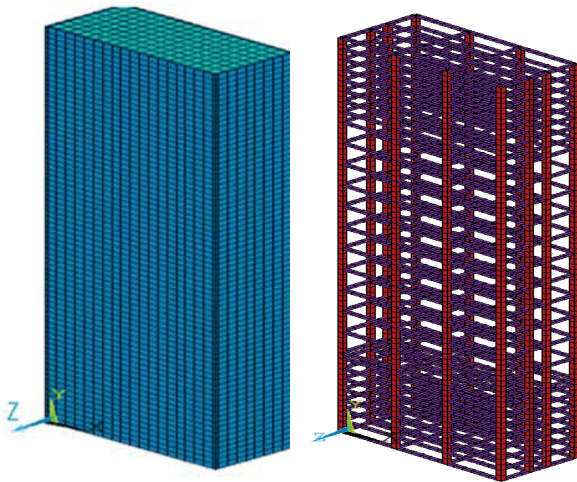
3D of concrete column mesh and 3D view in reinforcement
